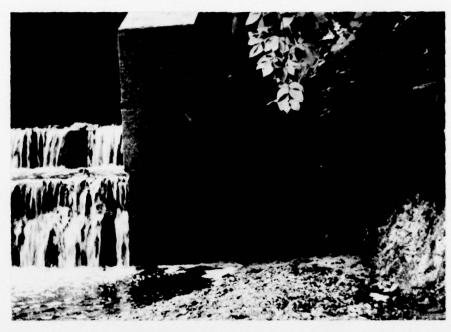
Detail showing loss of material and seepage around the toe of the left abutment.
